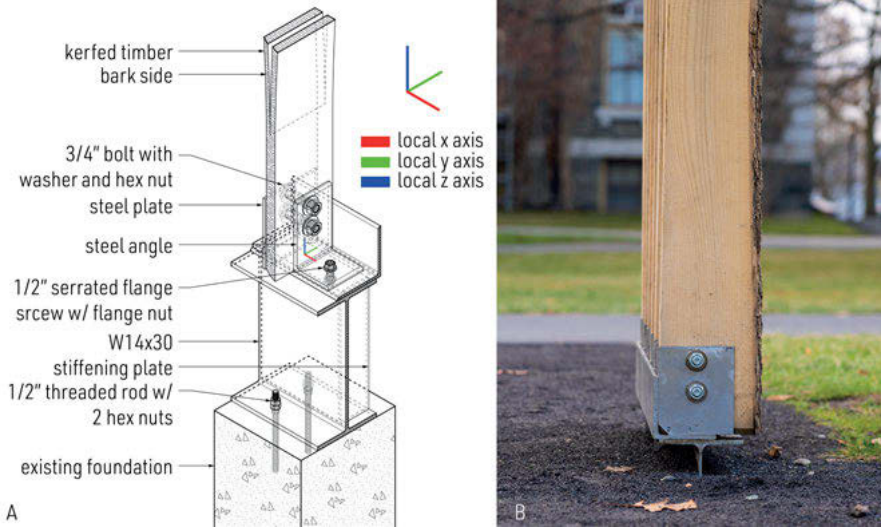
Foundation Connection: (A) axonometric of foundation detail with support definition; (B) Photo of Ground Connection. (Photo by Cynthia Kuo)
